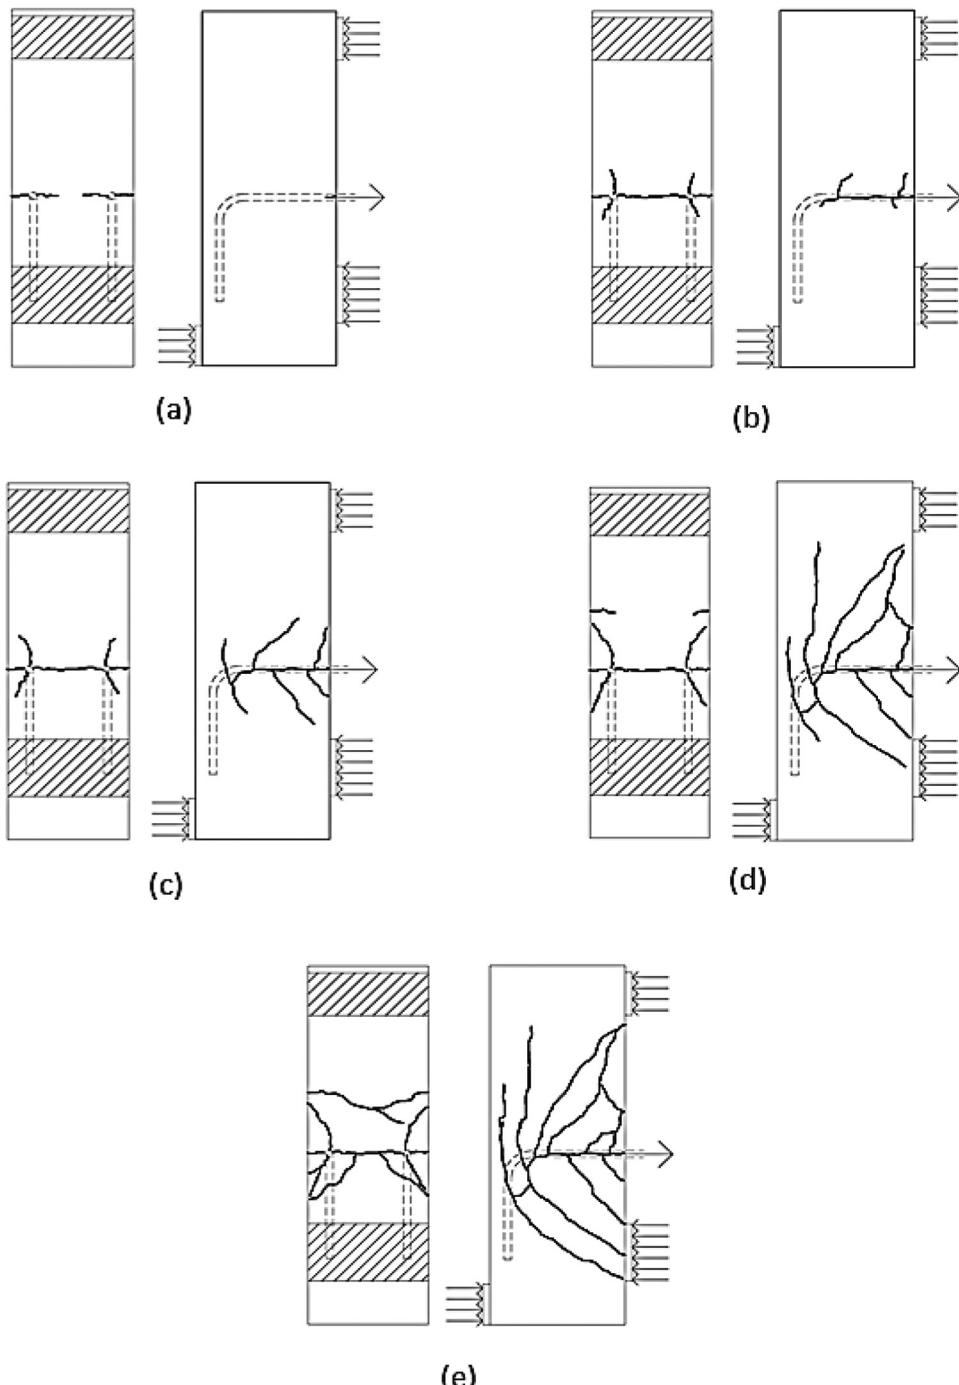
Front and side views of specimens indicating typical crack progression from: (a) low loads to (e) failure.
